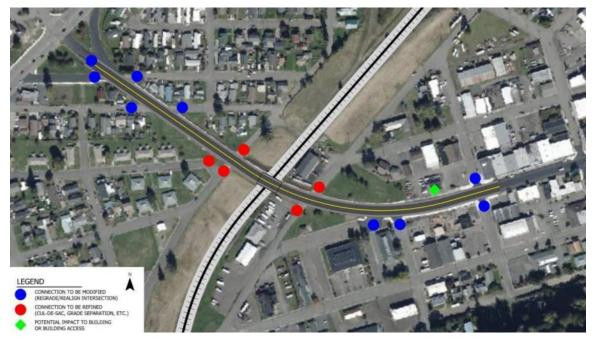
A1-2. OR 38 Rail Overcrossing with Retaining Walls
